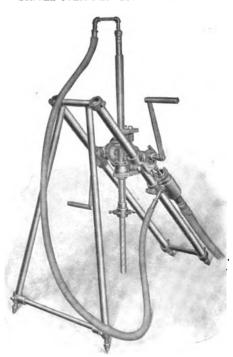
HAND-POWER DRILL IN POSITION FOR VERTICAL BORING.
